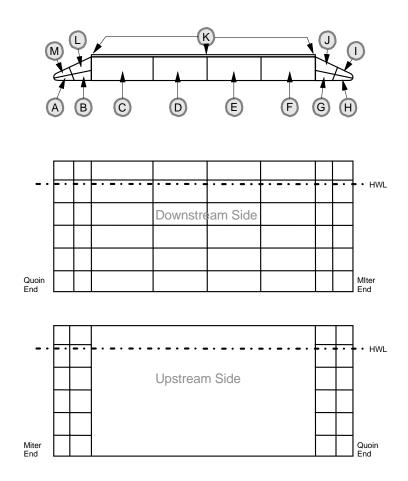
LOCK GATE VERTICAL, DOWNSTREAM AND UPSTREAM STRUCTURAL LAYOUT
